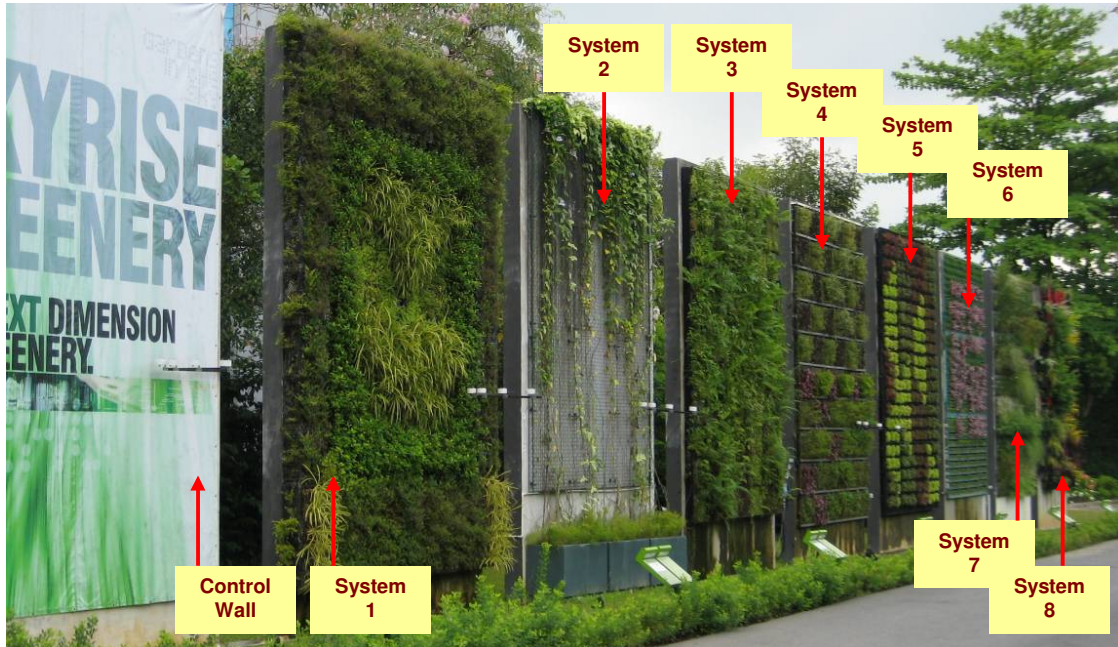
Control wall and the 8 vertical greenery systems in HortPark
